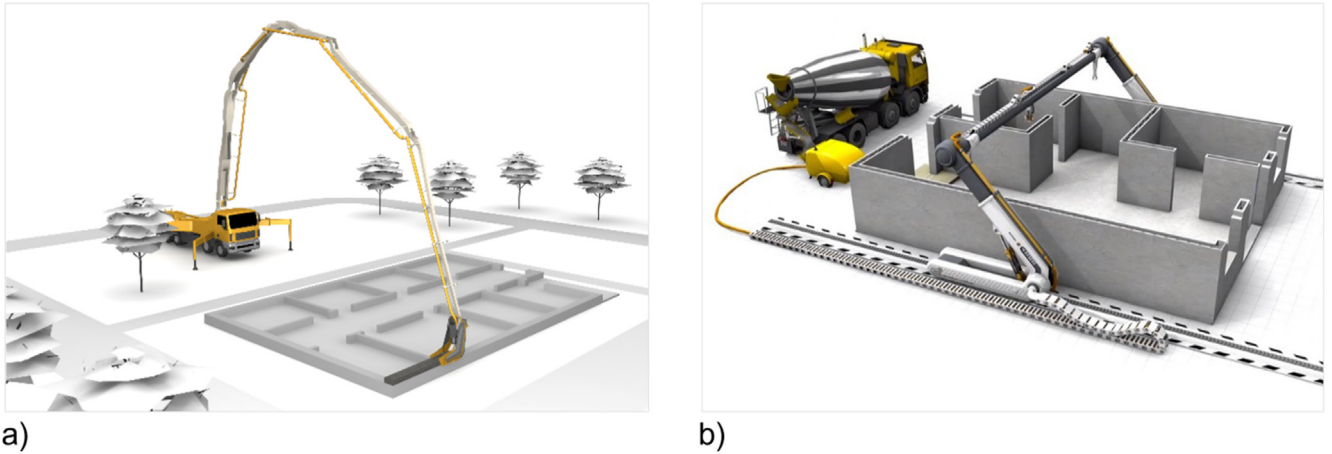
Examples of concrete printing technologies: a) a CONPrint3D: concrete boom pump is depicted pumping and precision-placing fresh concrete (source: TU Dresden), b) Contour Crafting: a concrete pump is depicted pumping concrete to a rail-mounted robotic printhead (source: University of Southern California).
